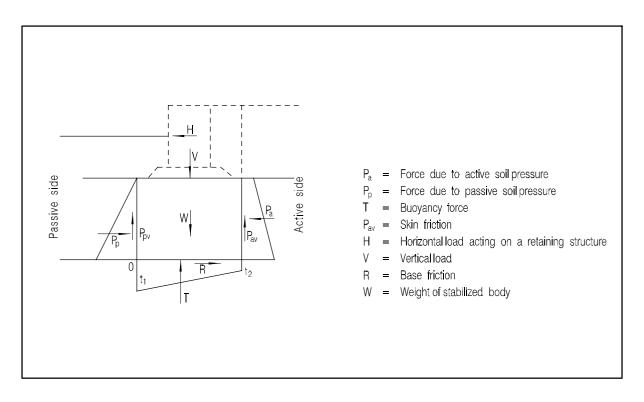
External Forces on Soil Body Stabilized by Deep Cement Mixing
